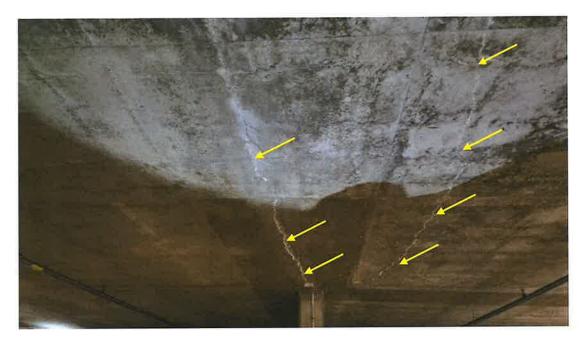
Typical Shrinkage Cracks at Underside of 1st Level. Note Efflorescence Emanating from Cracks
